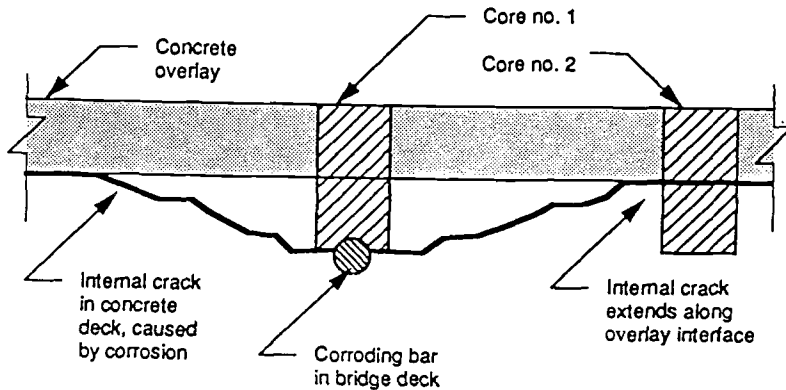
Mode of Internal Concrete Fracture in Concrete Overlaid Bridge Decks
